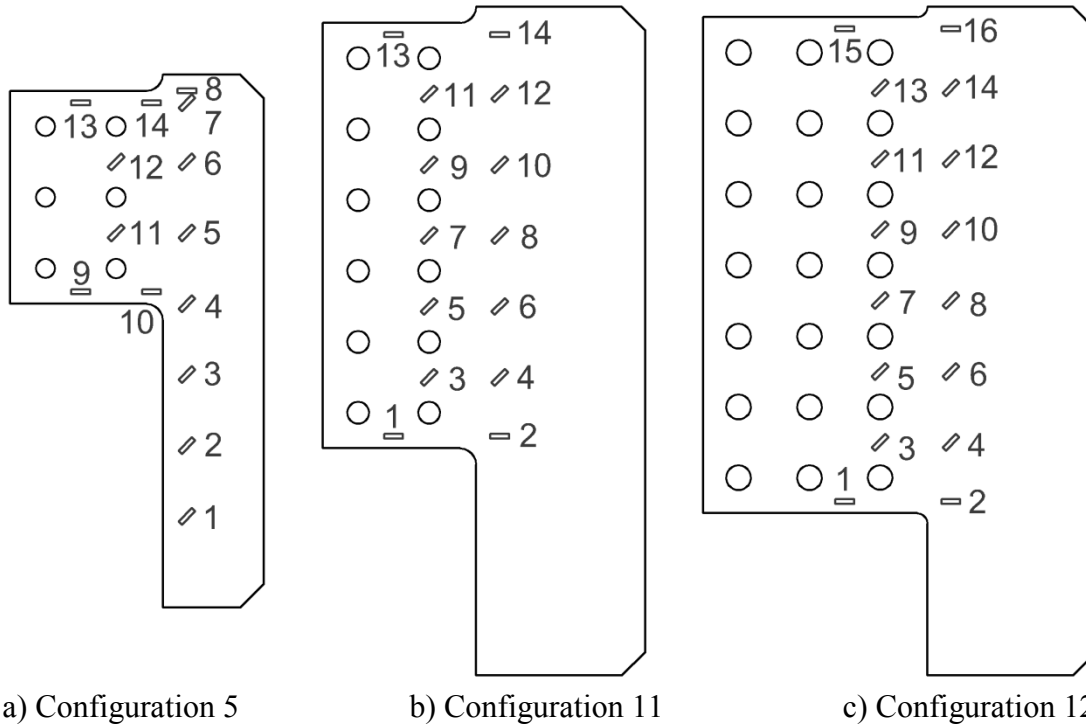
Strain Gauge Layout, Full Height Beam-to-Girder Shear Tab Connections
